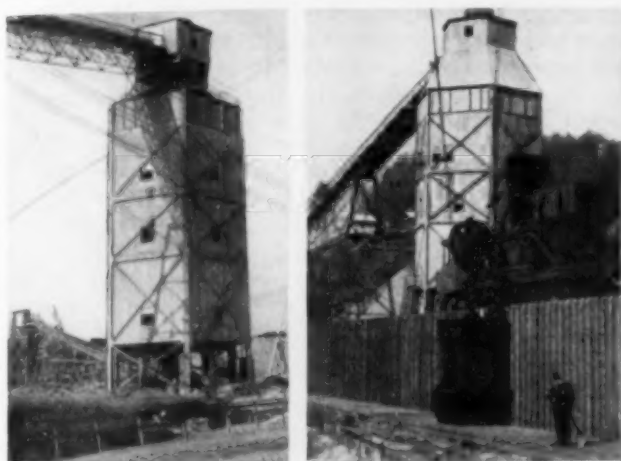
THE MIXER PLANT ORIGINALLY USED AT PICKWICK LANDING (LEFT) HAS BEEN REVAMPED AND TRANSFERRED TO HIWASSEE (RIGHT)
